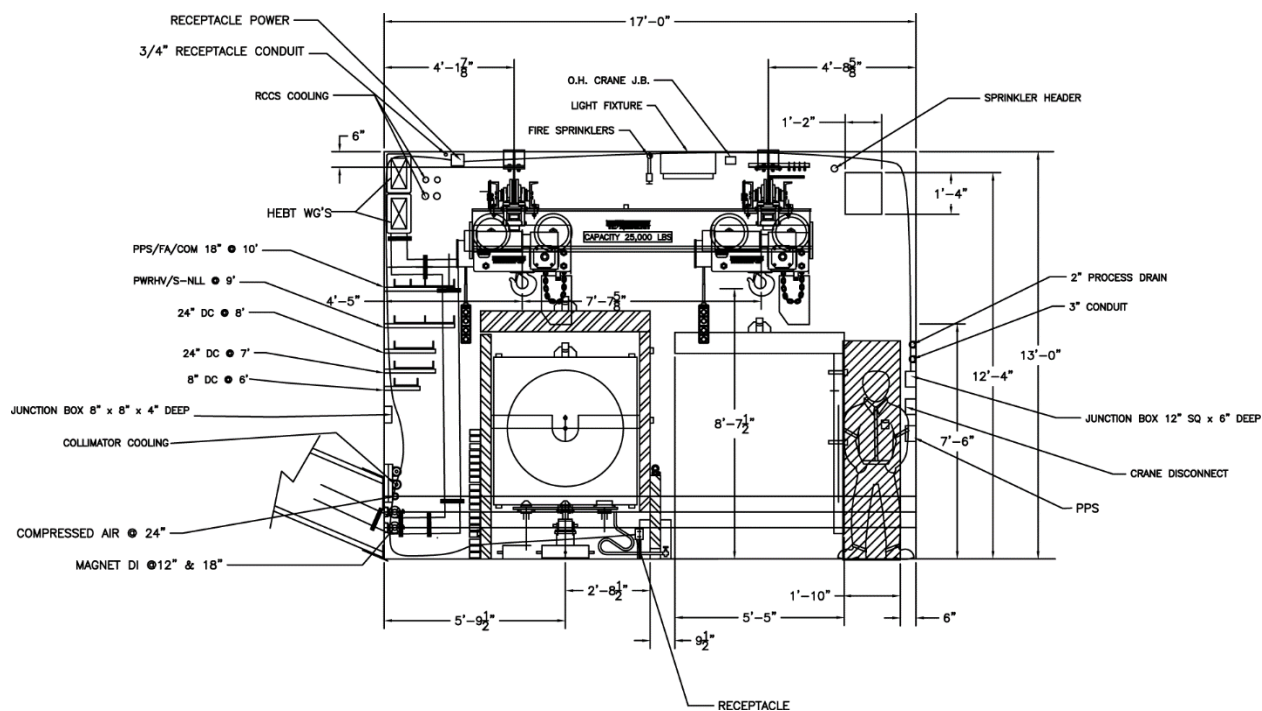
HEBT tunnel cross section (schematic illustration).
